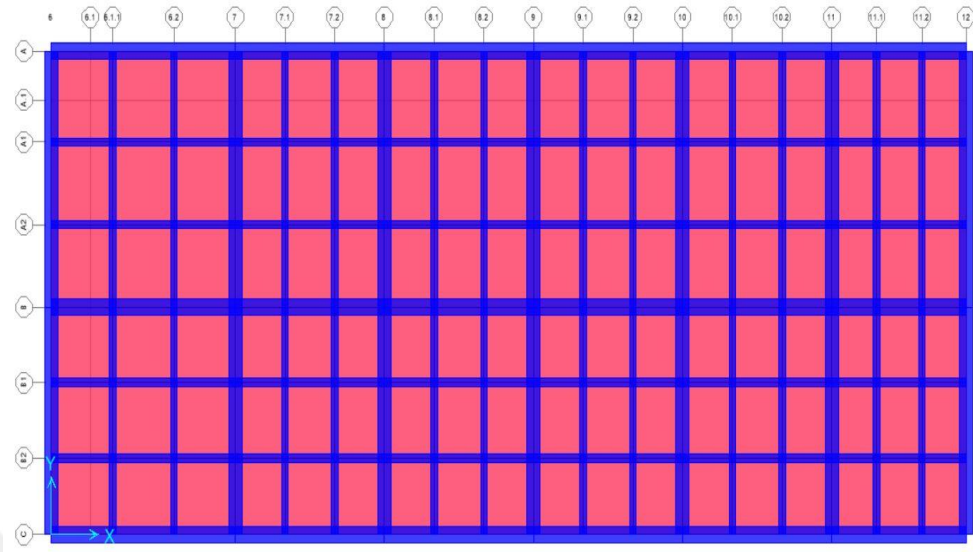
Third floor plan view of the structure in the XY plane(SAP2000 Floor Plan Image, prepared within the scope of this thesis study.).
